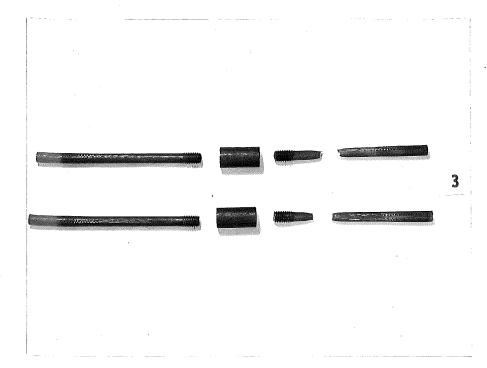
Failure photograph of No. 1 type hook bolt showing failed sections along straight portion of the bar.
